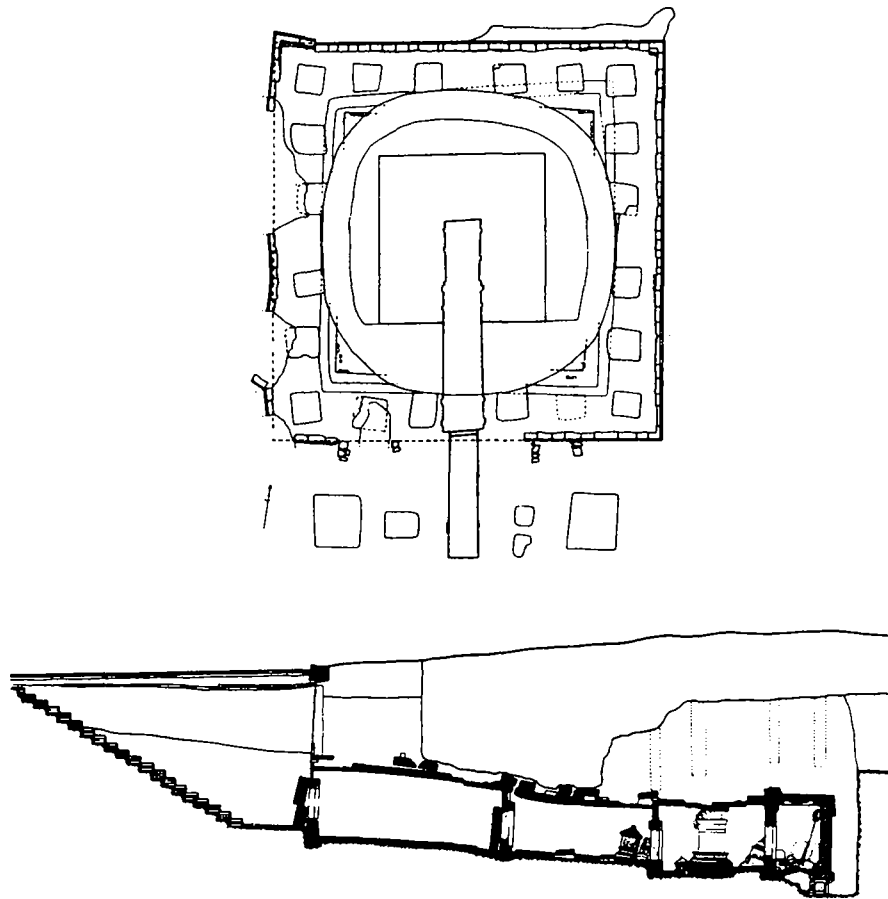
Excavation plan (scale: 1 : 500) and section of the underground palace (scale: 1 : 200) of the pagoda of Famen-si 法門寺 법문사 near Xi'an 西安 서안 (659 AD ?) (after: WW 88 - 10, pp. 2,4)
